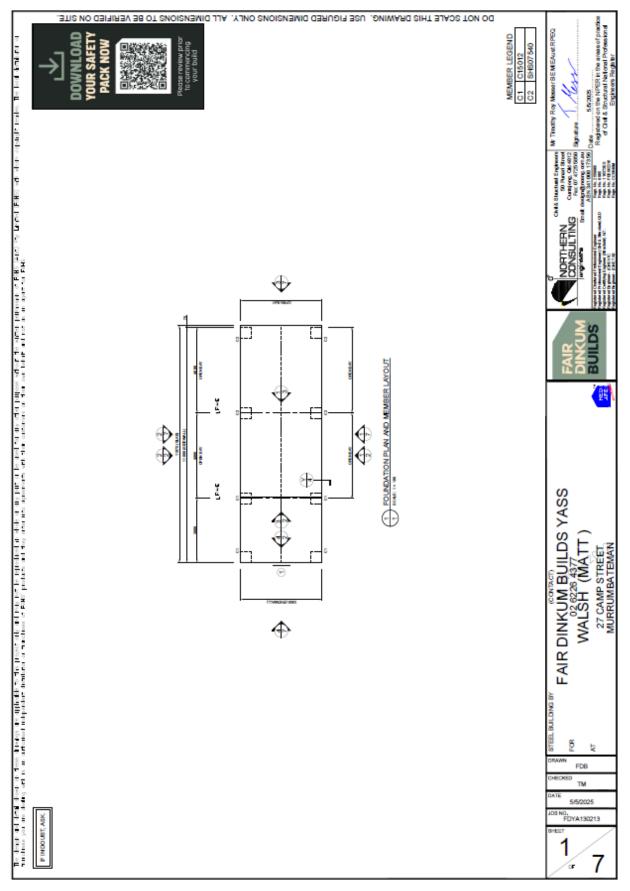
Foundation Plan and Member Layout (Source: Fair Dinkum Builds and Northern Consulting Engineers, May 2025)
